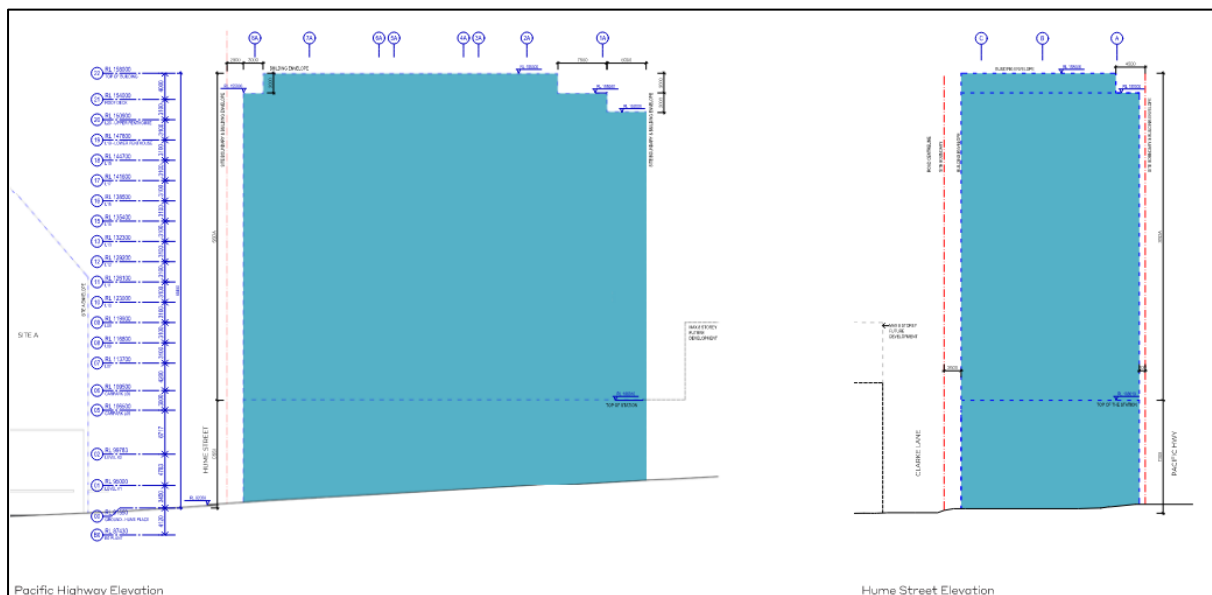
Approved Building Envelope Pacific Highway and Hume Street Elevations (Source: Woods Bagot, 2024)
